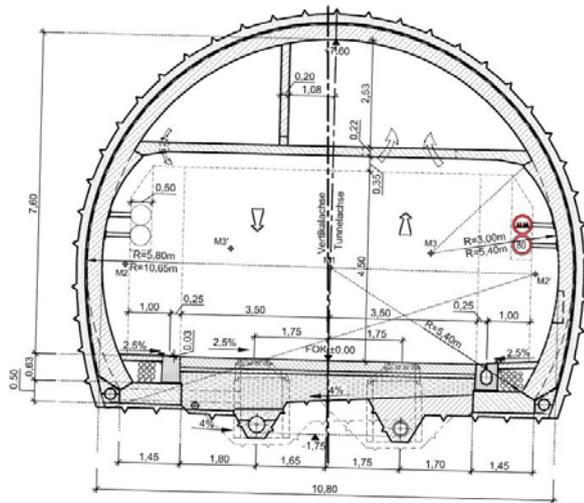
Typical cross section of a street tunnel with unreinforced inner lining.
